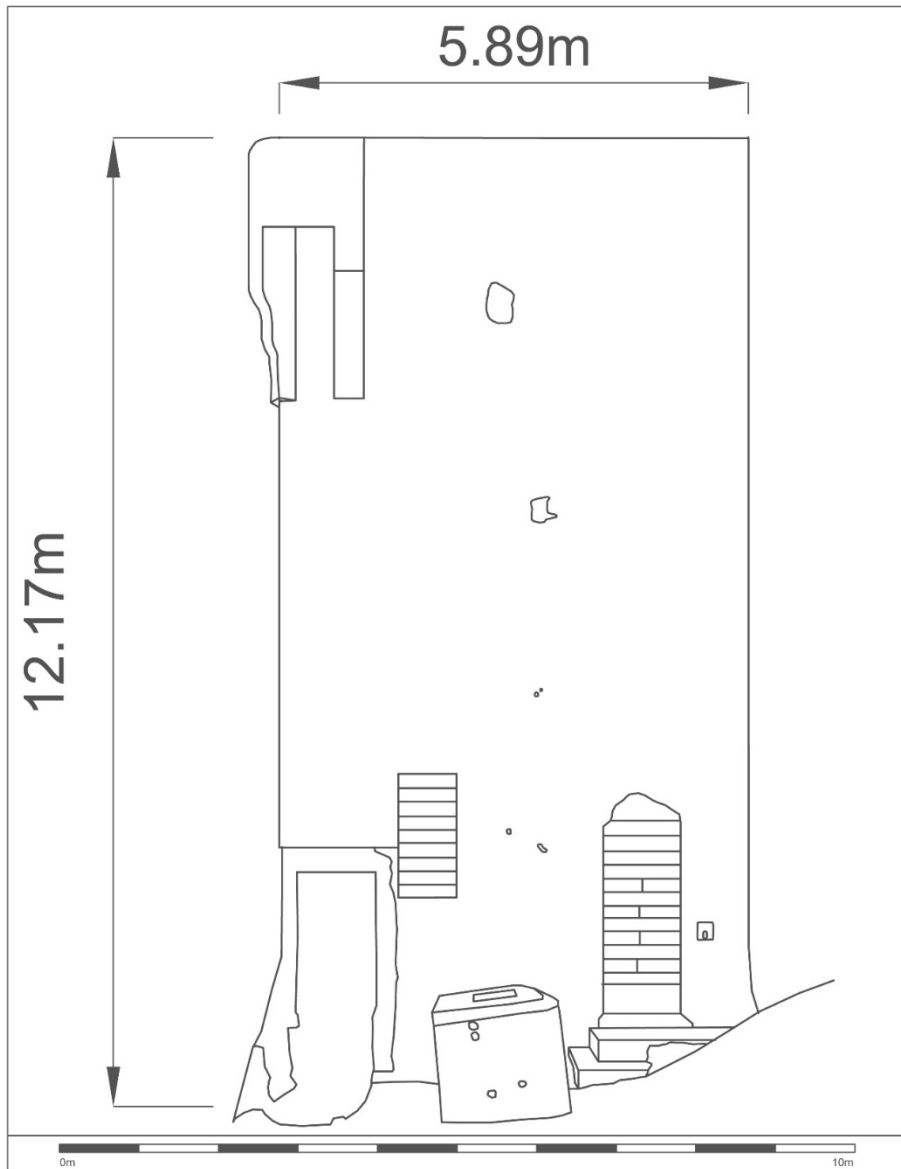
External elevation of the north-east wall of the heavily modified signal tower at Malin Head Signal Station.
